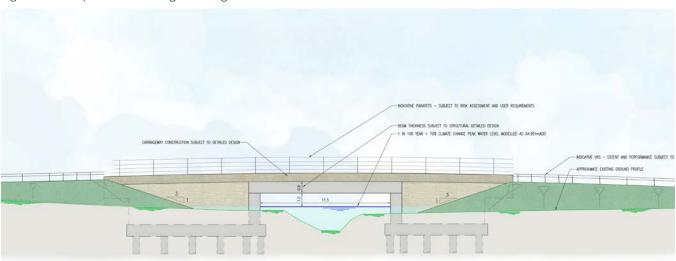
Illustrative cross section demonstrating a potential design for the bridge to cross the Chil Brook Page 195
